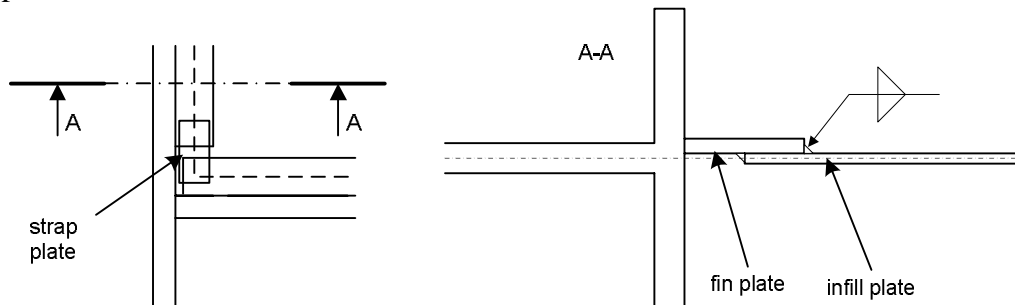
Conventional detail of the fin plate connection to infill plate with welding.
